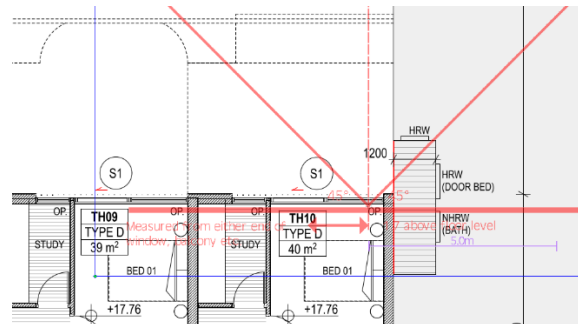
the west-facing, second-floor balcony and associated HRW of No. 27 Barrow Place and views from the second floor of dwelling TH10.
